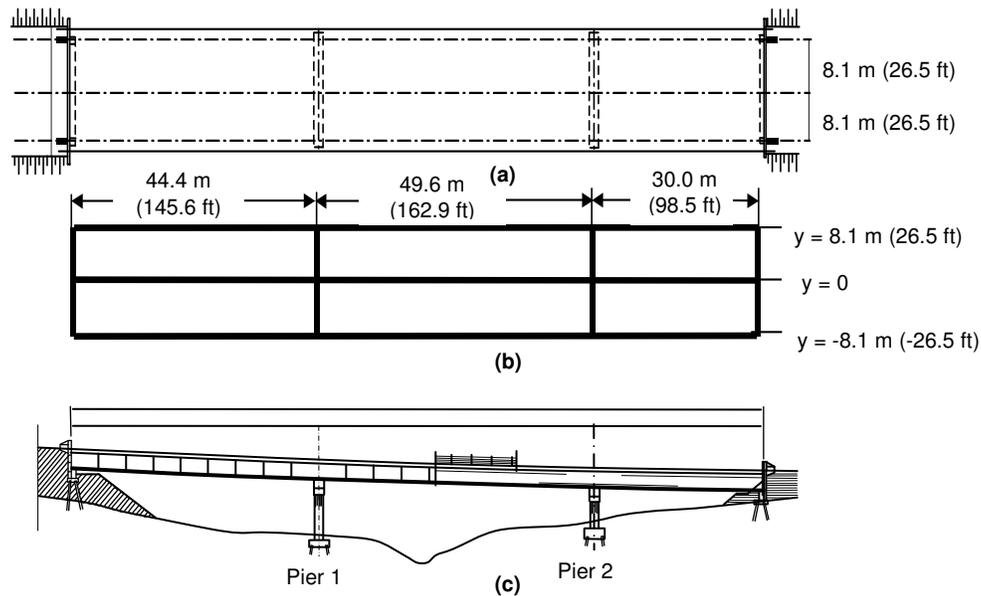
(a) Plan of Portage Creek Bridge, (b) Simplified Bridge Geometry, and (c) Elevation.
